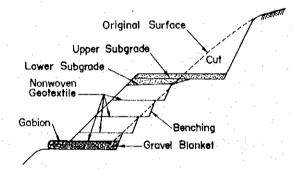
Cut and Fill Section with Nonwoven Geotextile
